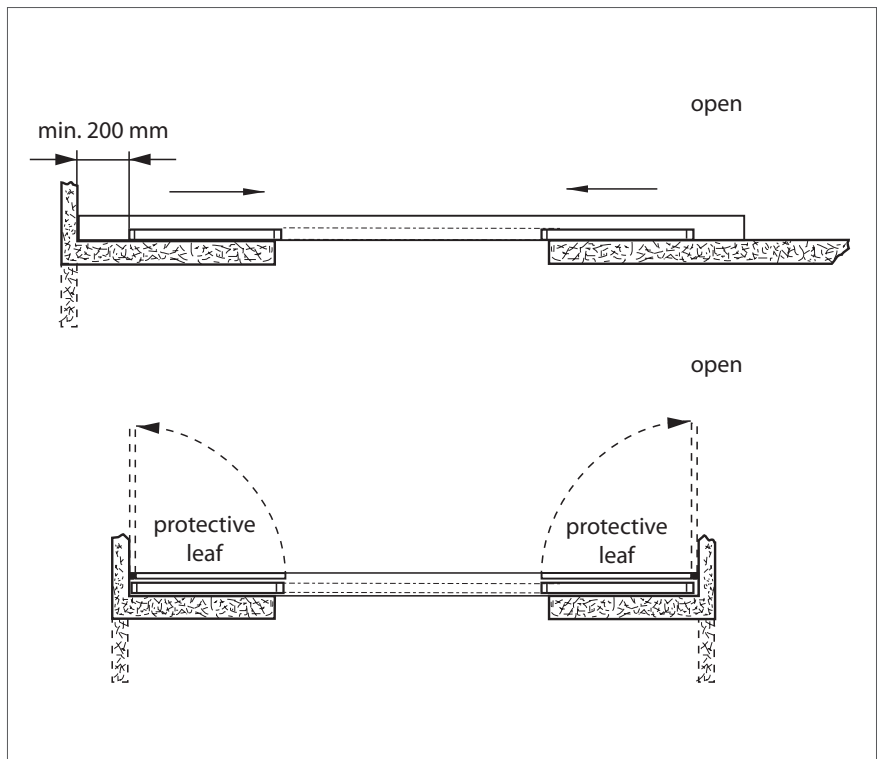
· Wall fixing/installation into lintel, double-leaf version
